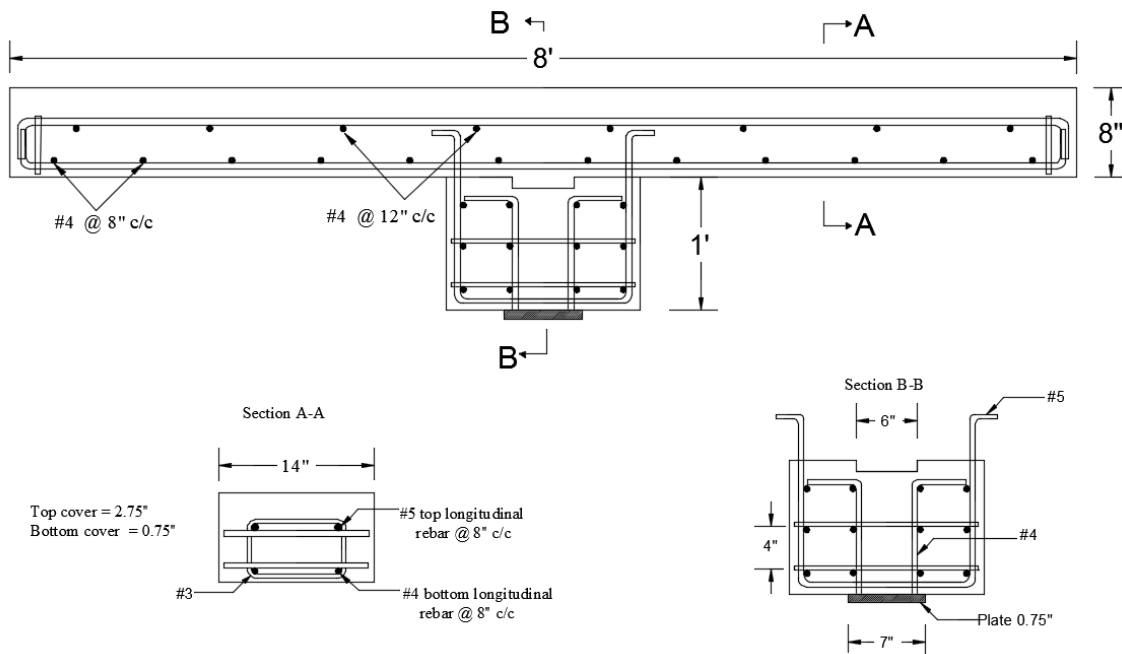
Sectional Details of Slab with Rigid Connection Type
